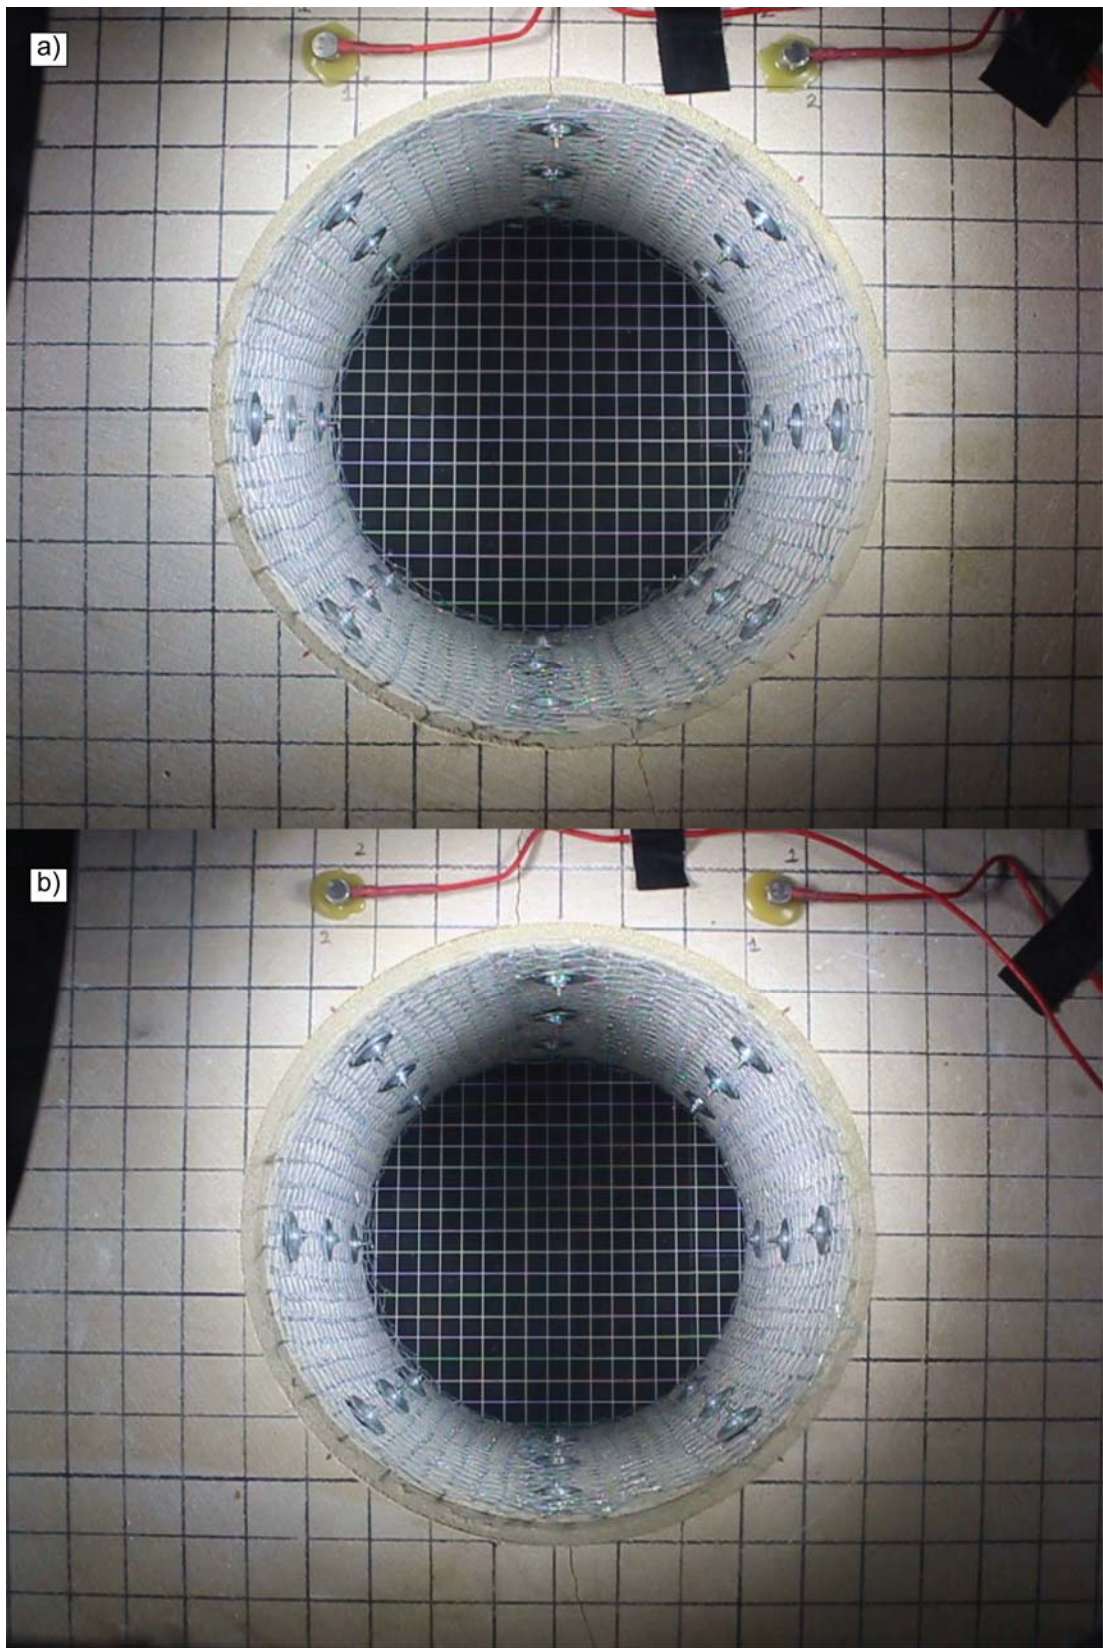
Specimens before spalling a) Specimen No.12 b) Specimen No.15.
